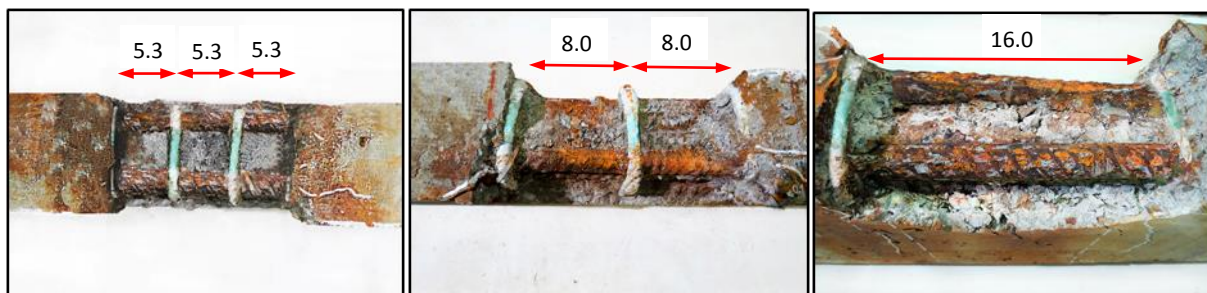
Corroded rebar in Group T (unit: cm)
